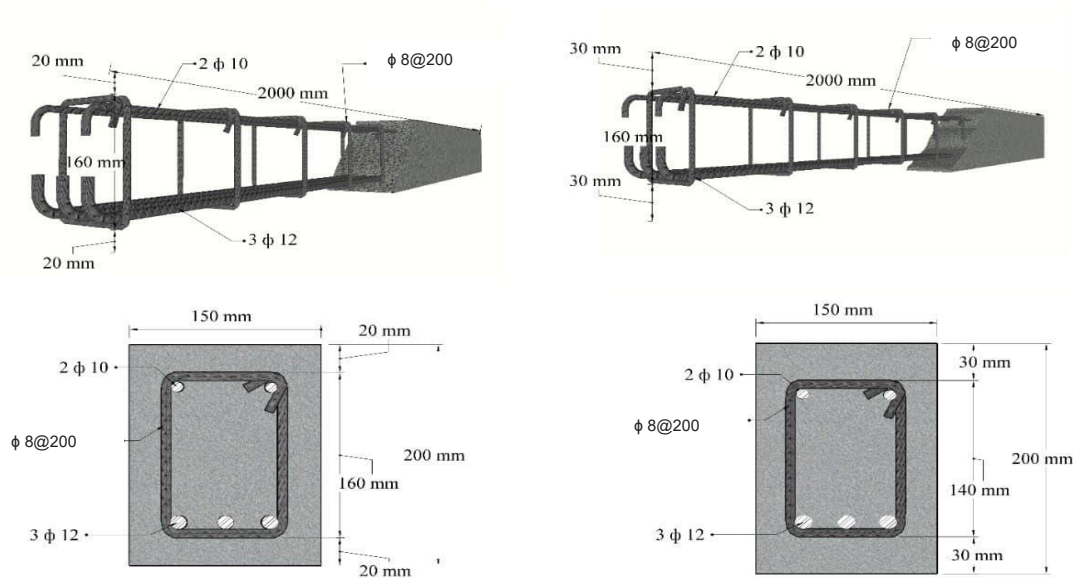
Main section geometry and typical LWC beam cross-section (dimensions are in mm).
